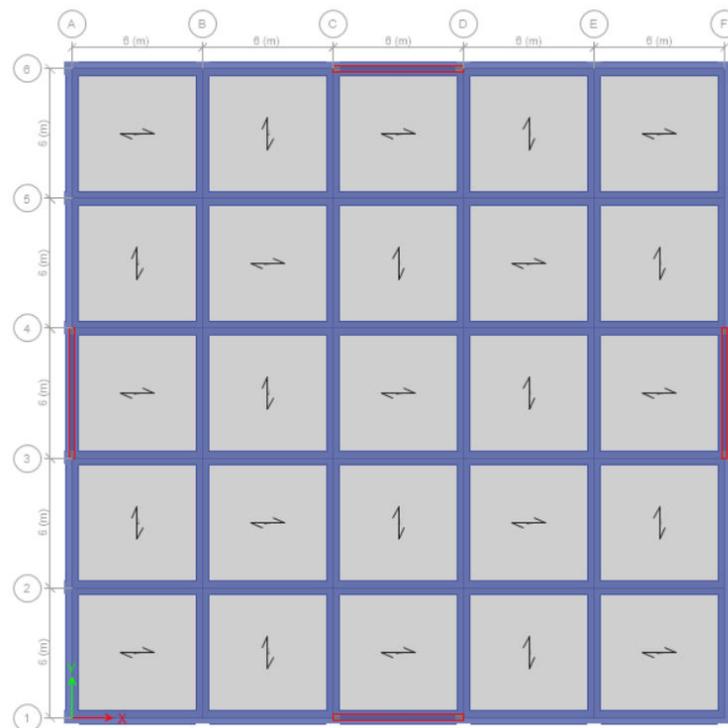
Schematic of structure plan geometry of dual bending frame with shear wall
